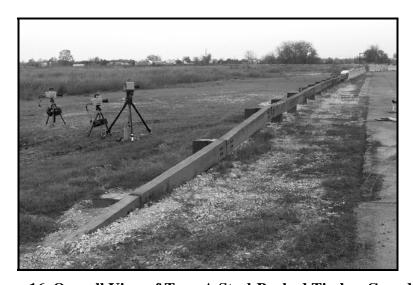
Overall View of Type A Steel-Backed Timber Guardrail
